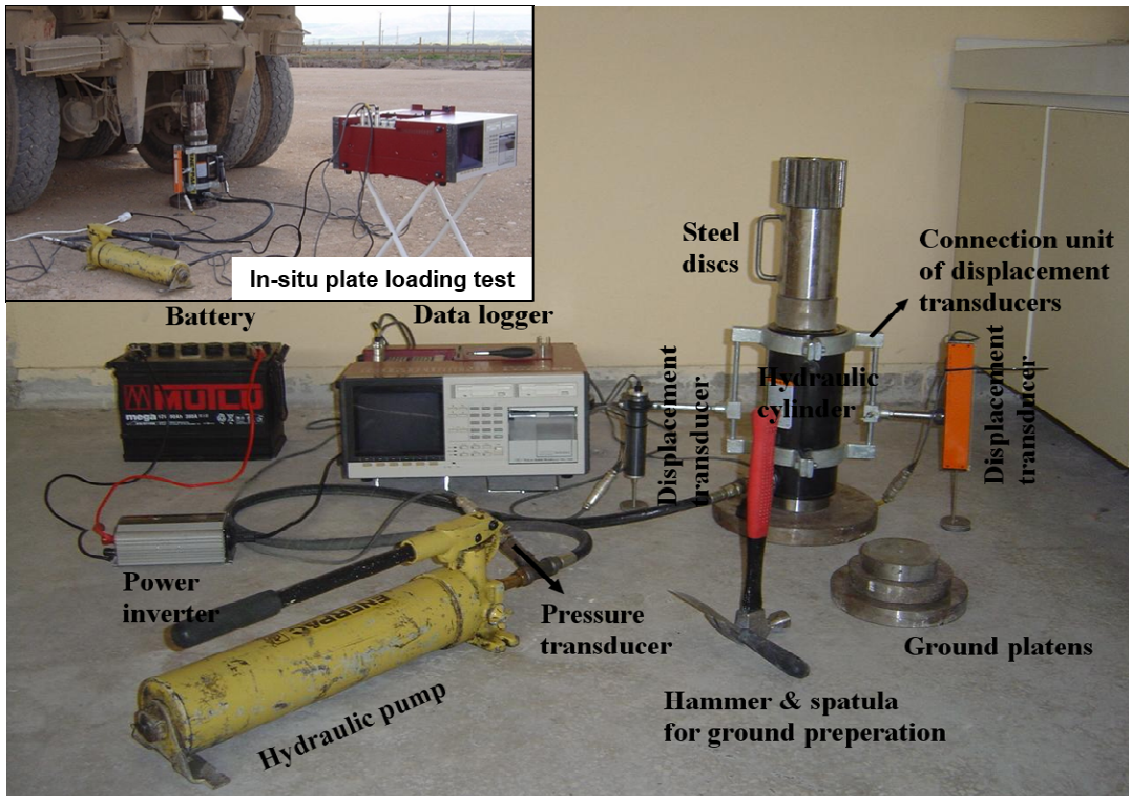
Plate loading test equipment and field set-up (Gül and Ceylanoğlu, 2013).
